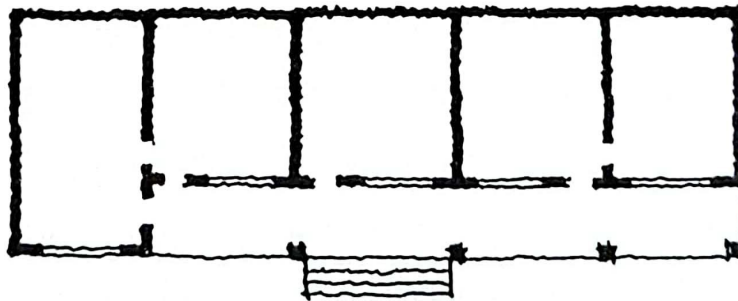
Floor plan of an example “Key-head” style house.⁵¹
